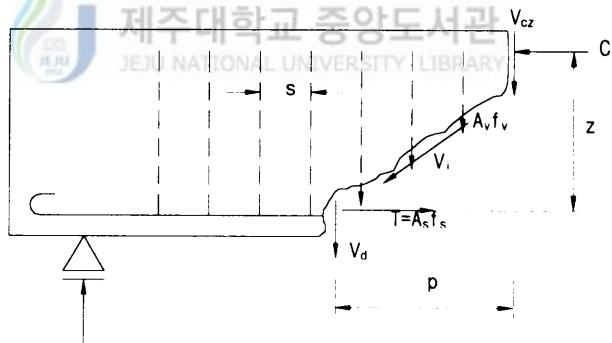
Force distribution after diagonal crack of reinforced concrete beam with shear reinforcements
